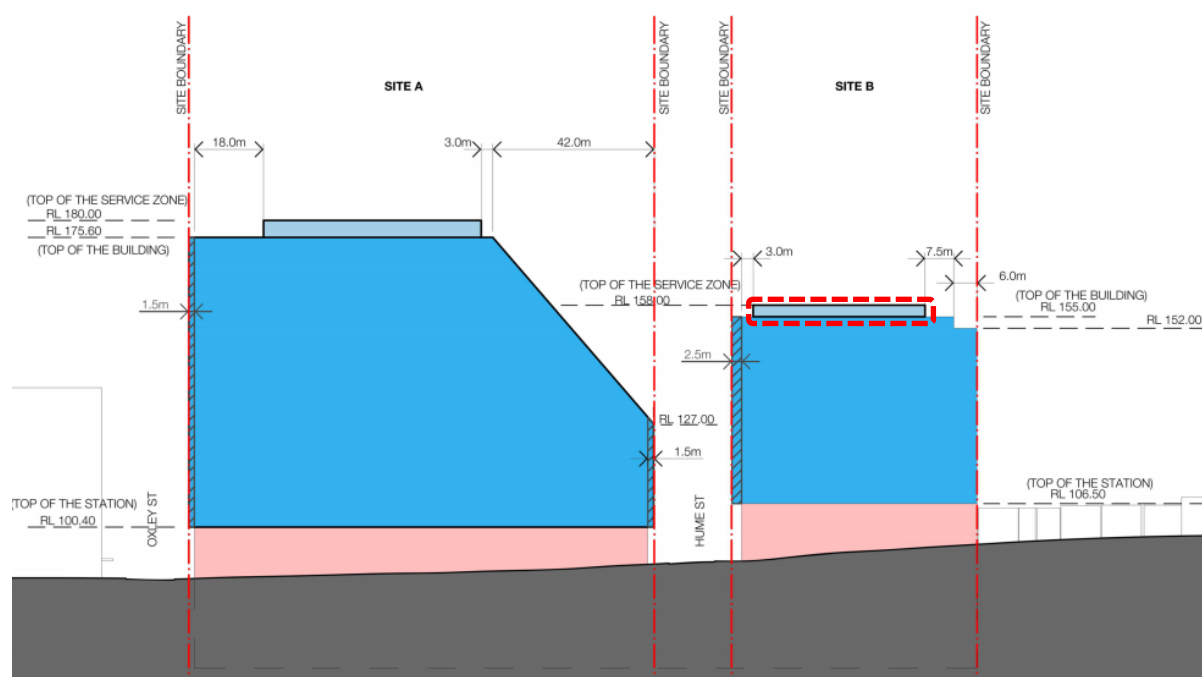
Site B building envelope with services zone indicated on the roof (red dashed)
